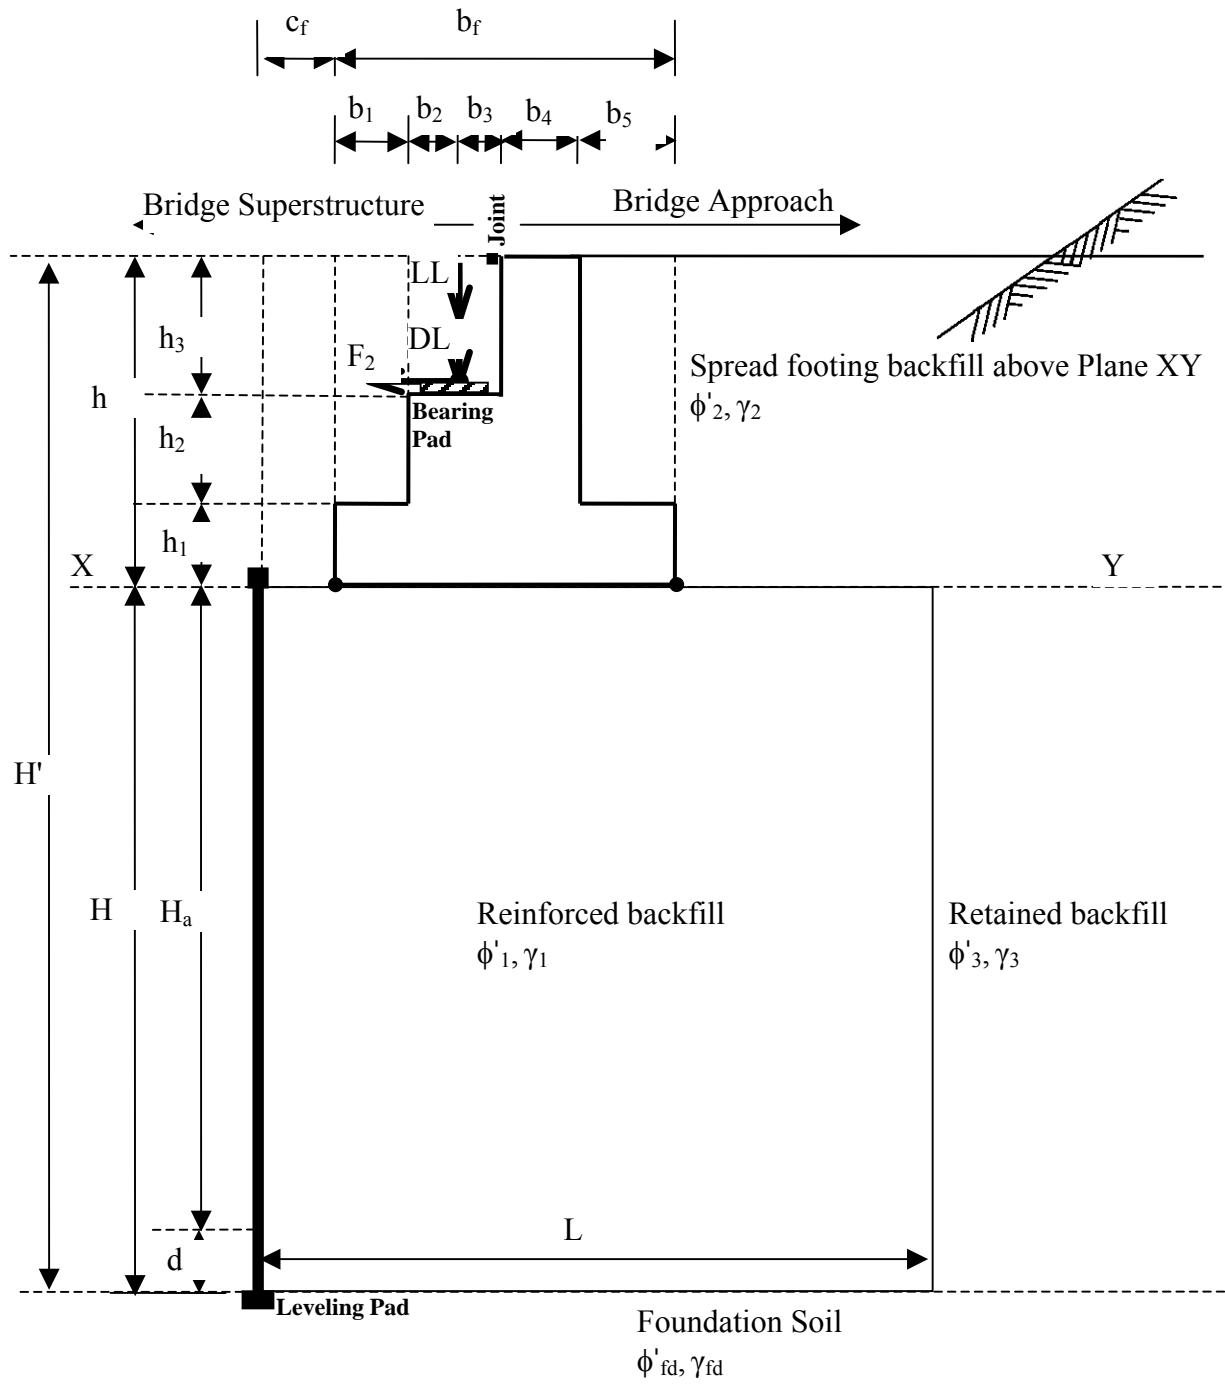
Configuration showing various parameters for analysis of a bridge abutment supported on spread footing on top of an MSE wall (not-to-scale).
